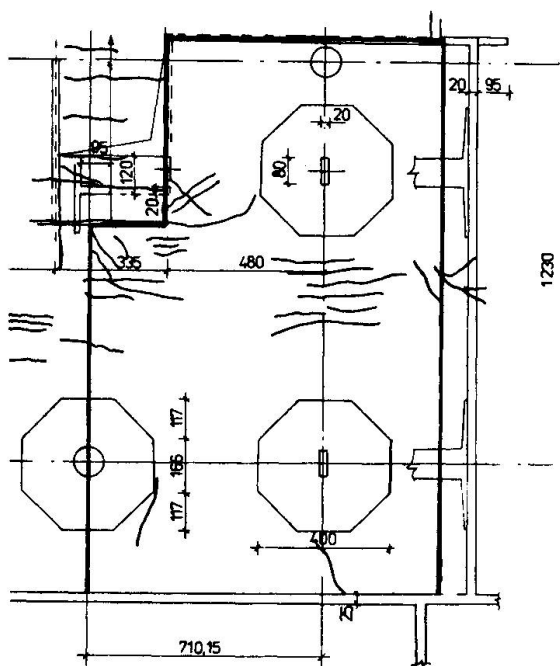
Garage slab. Plan view of the slab section with observed cracks.
